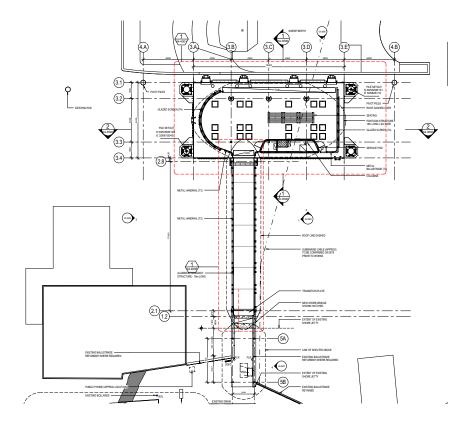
Proposed wharf plan (image courtesy of Conrad Gargett Ancher Mortlock Woolley)
